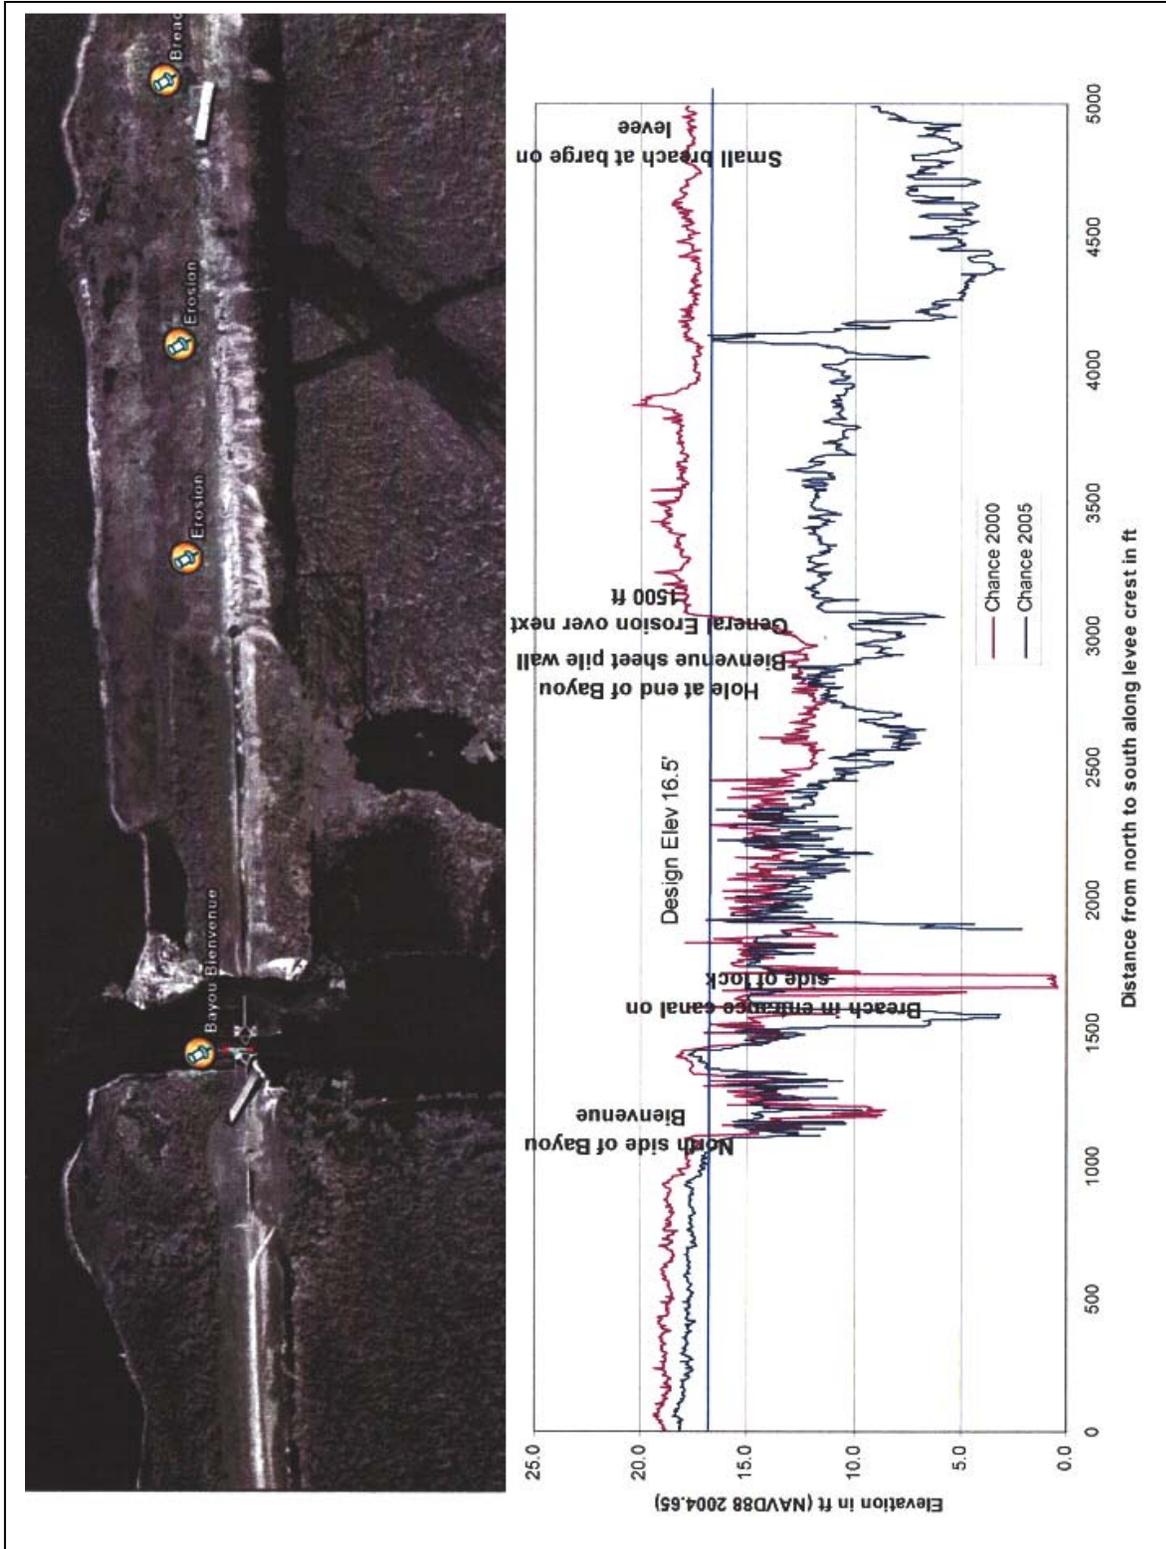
LIDAR survey data showing crest elevations before and after hurricane Katrina along a section of the MRGO frontage levees at bayou Bienvenue, and corresponding post-event plan view aerial photo along the same section.
